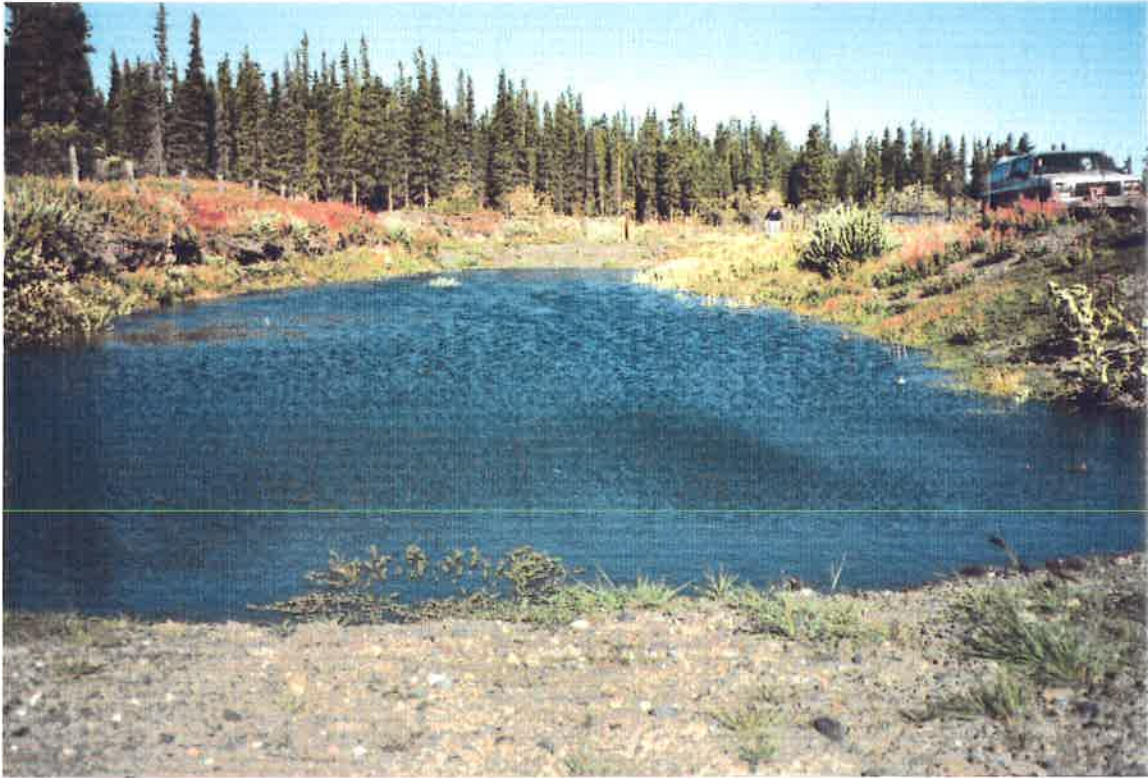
Photo C: Destruction Bay Sewage Lagoon - First Additional Containment Pond
